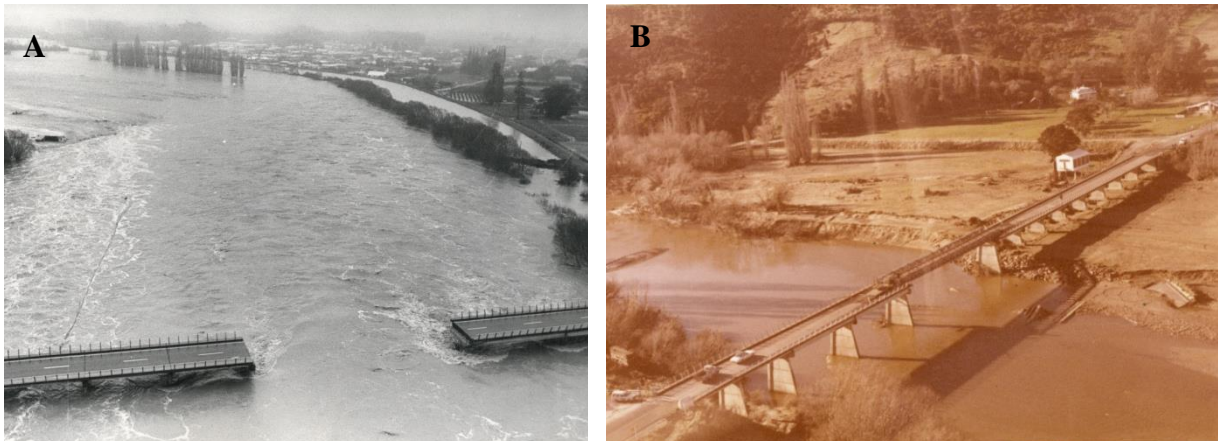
A. Outram Bridge during the June 1980 flood (6 June at 3pm); B. Outram Bridge, with temporary Bailey bridge constructed post-event.
